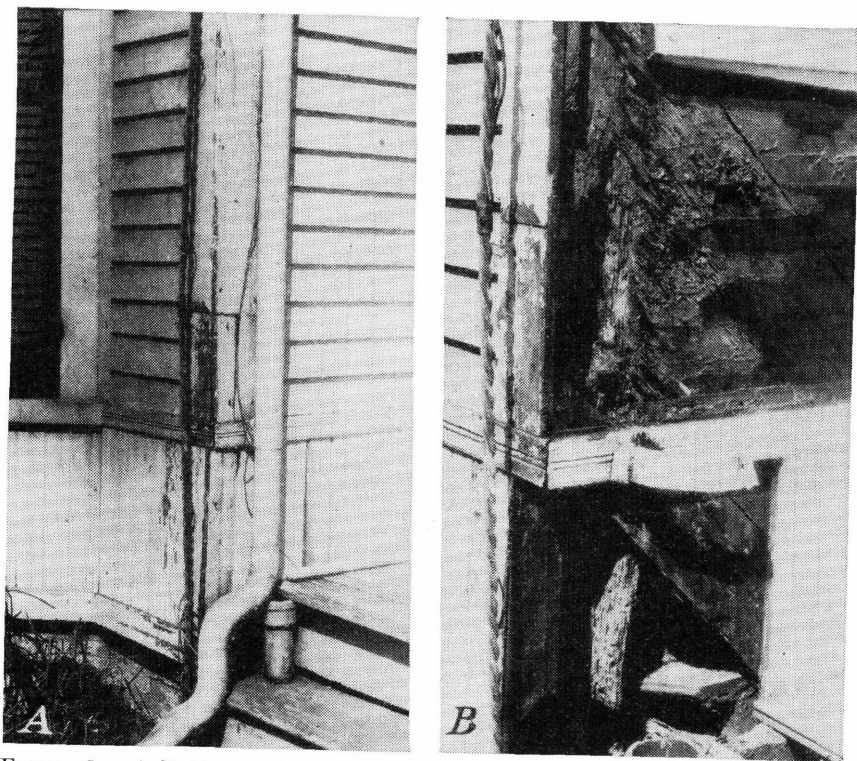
A, Evidence of termite damage from the outside of a building, which is usually inconspicuous; B, siding removed from the same building to reveal extent of damage to the sill, studding, and subsiding.
